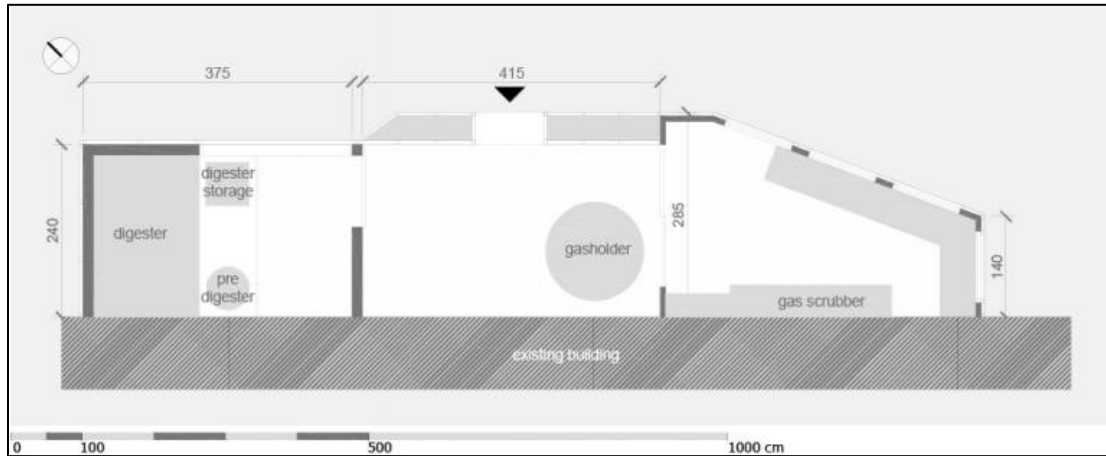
Layout plan of the Camley Street micro-scale anaerobic digestion facility. (Adapted from: Pracucci & Zaffagnini, 2019).
